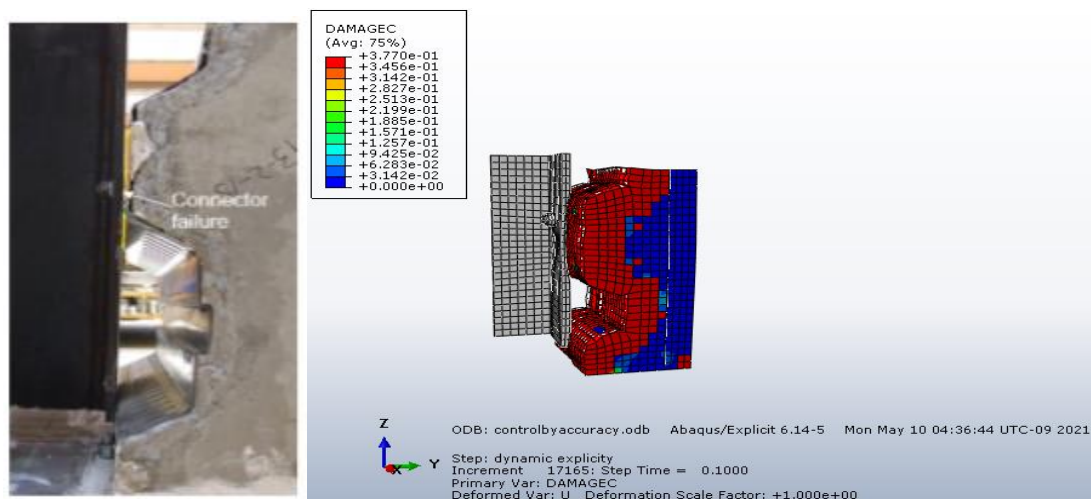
1 Concrete slab failure in both of experimental and FE results.
